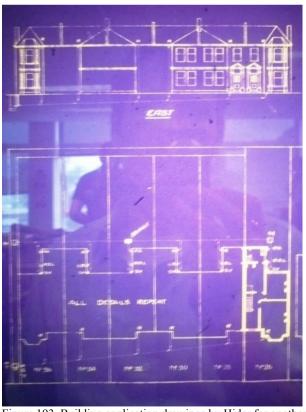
Building application drawings by Hider for another row of terraces in Balloch Road, 1905 (Ibid.)
